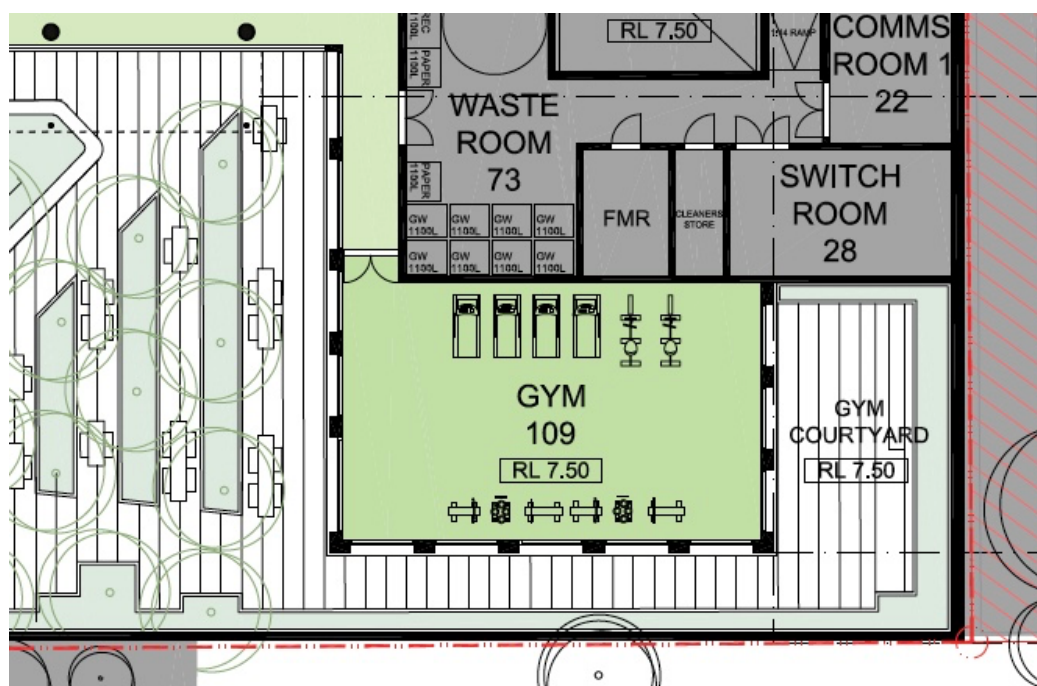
Revised Architectural Plans – Gym glazing on Lower Ground Floor Plan (DA03.0G1, Rev B).
